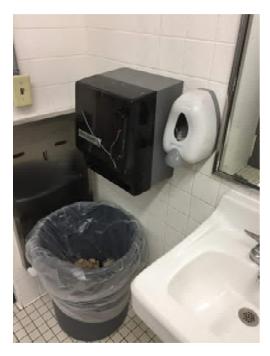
Paper towel dispenser in one bathroom has been damaged, should be replaced.
